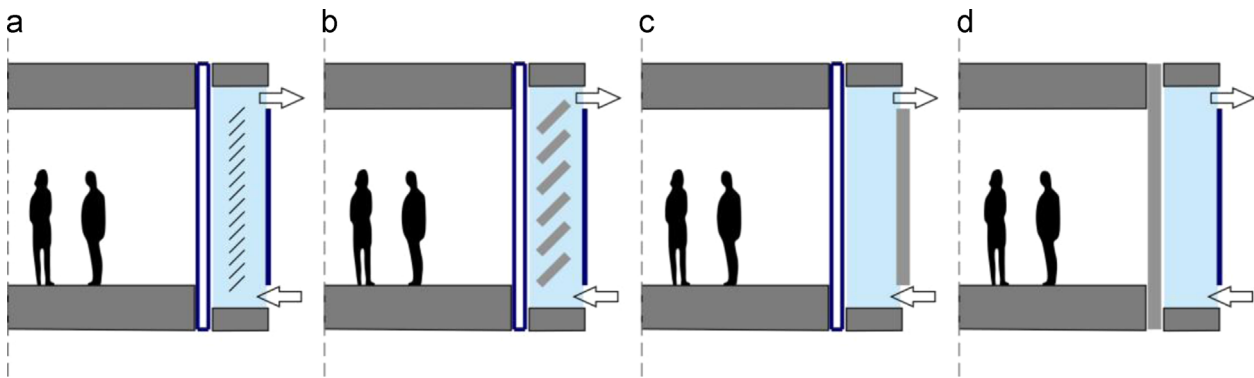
Models using thermal mass (concrete) proposed by Fallahi et al. [51]: (a) conventional DSF with inner layer made of double glazing, outer layer set as single glazing and aluminium venetian blind; (b) aluminium blind replaced by a concrete blind; (c) outer layer replaced by concrete; (d) inner layer replaced by concrete pane.
